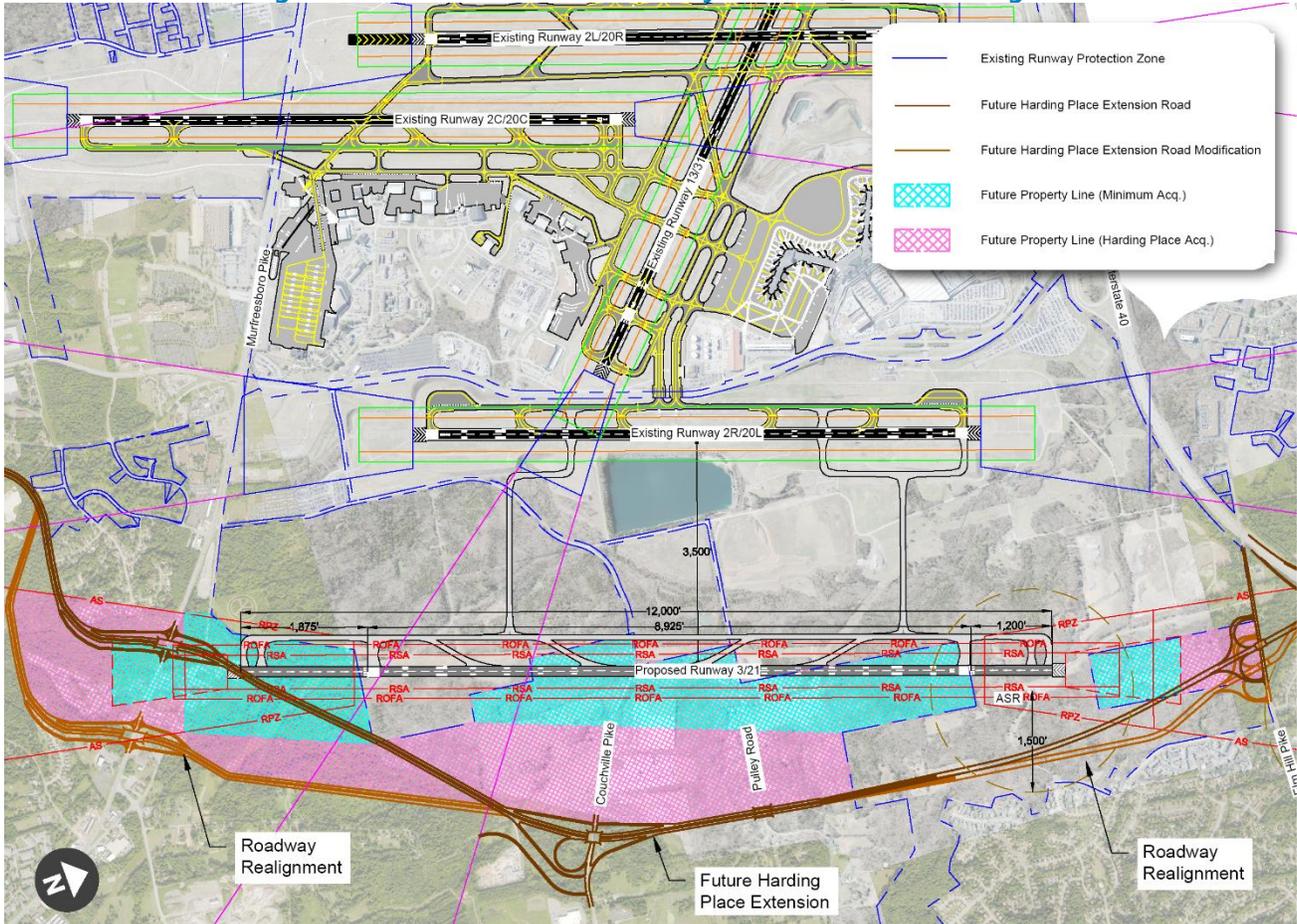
illustrates this master plan's concept, maintaining the prior-planned 3,500-foot runway centerline-to-runway centerline separation from existing Runway 2R-20L and protecting for a 12,000-foot long Runway 3-21, including a potential Harding Place extension. Due to the possibility that a future Harding Place alignment could penetrate the runway protection zones (RPZs) for planned Runway
